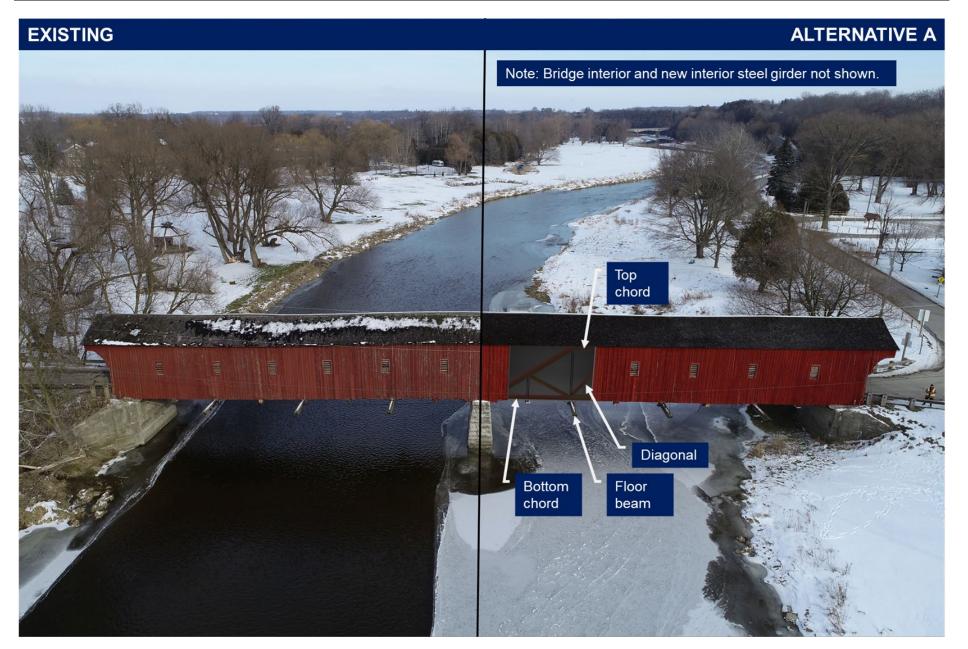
Elevation View – Existing and Alternative A (Steel Girder Reinforcement)
